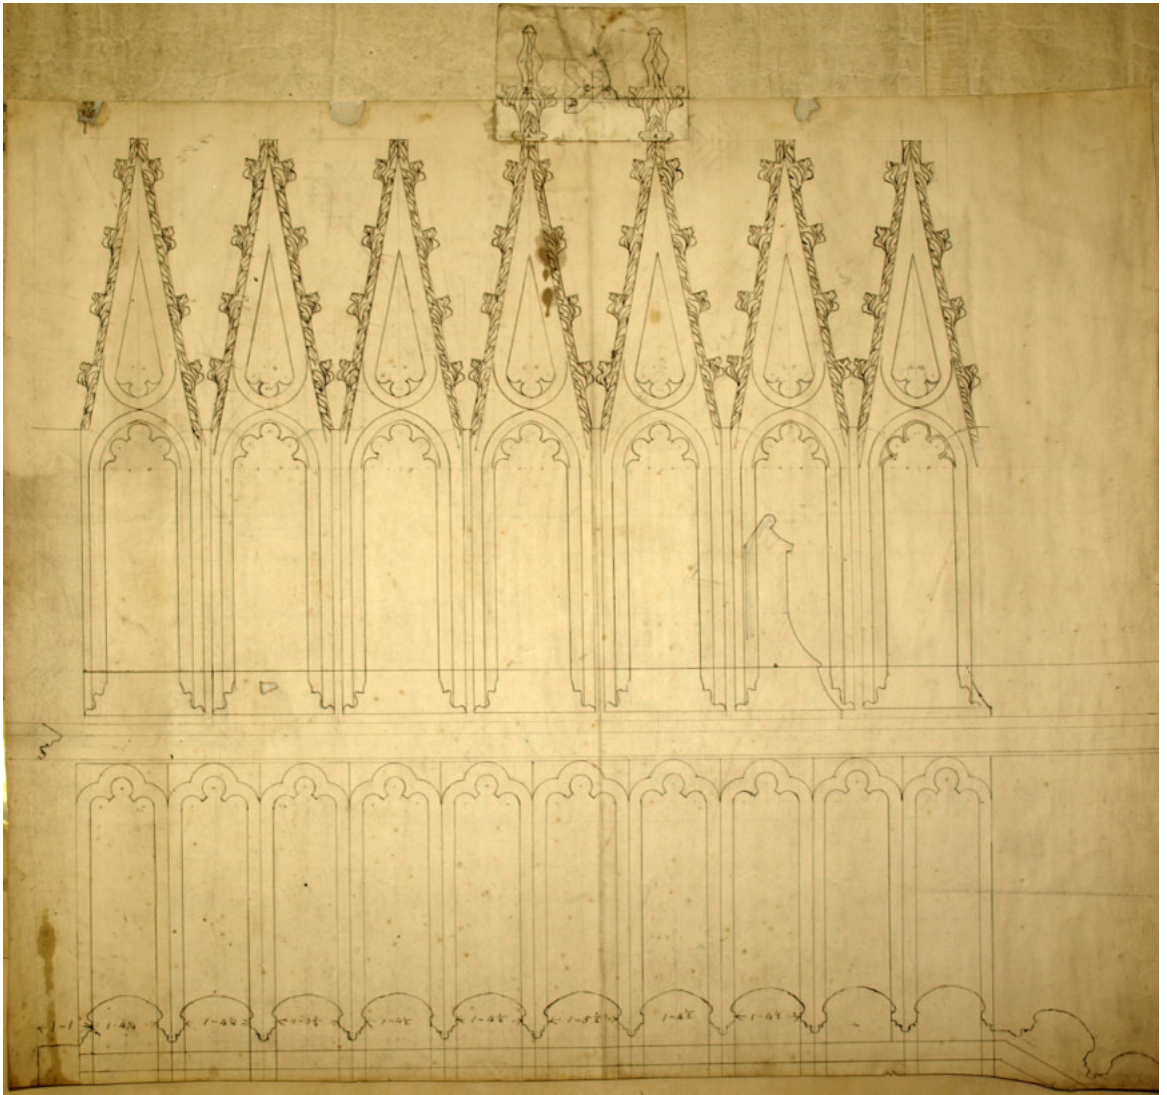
Elevation of north-aisle parapet gables and arcading, c.1850 (YML/3/14)
